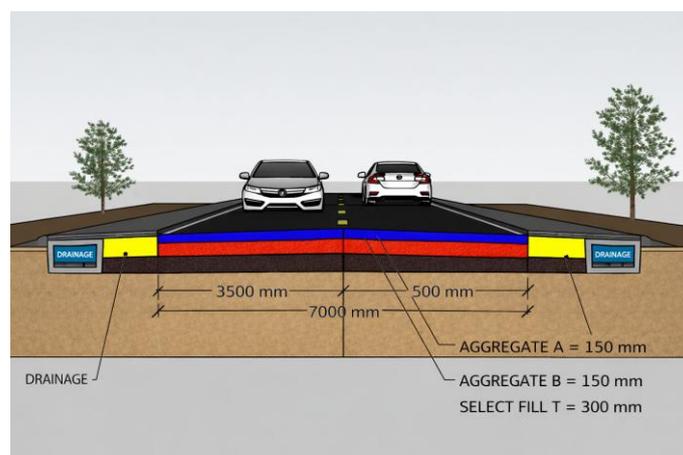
Pavement thickness under good drainage condition ($m = 1.0$).
